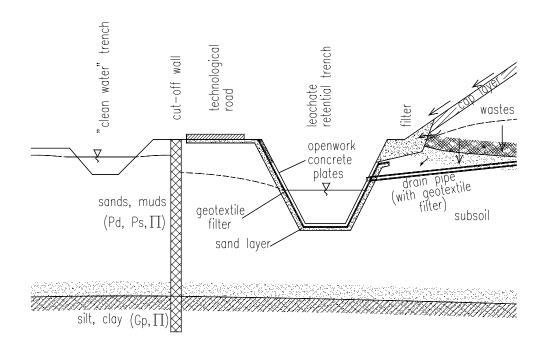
Scheme of drainage ditches construction at Radiowo landfill site (Koda and Paprocki 2000).
